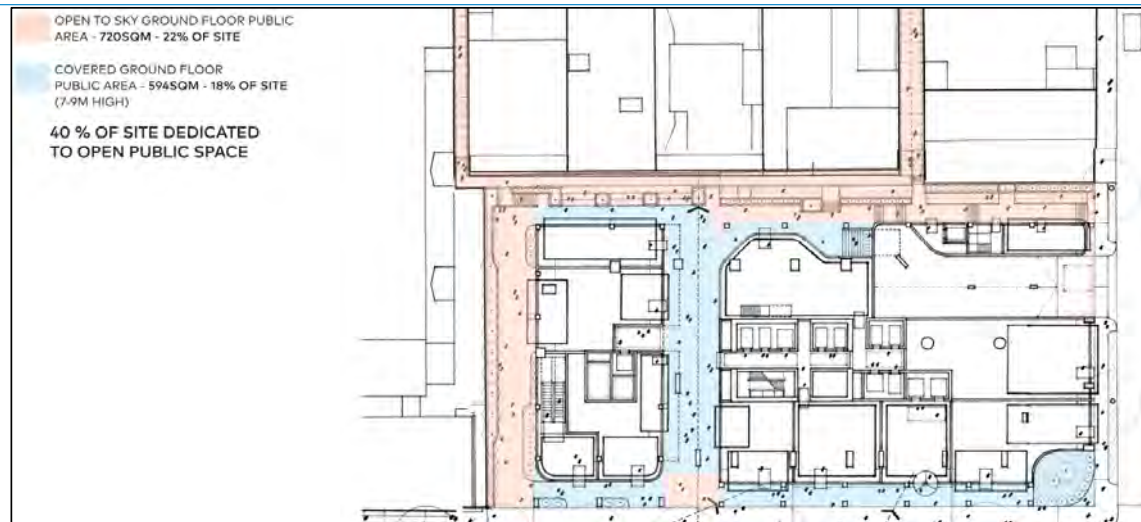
Layout of publicly accessible connections within the site (Source: Applicant dated June 2025)
